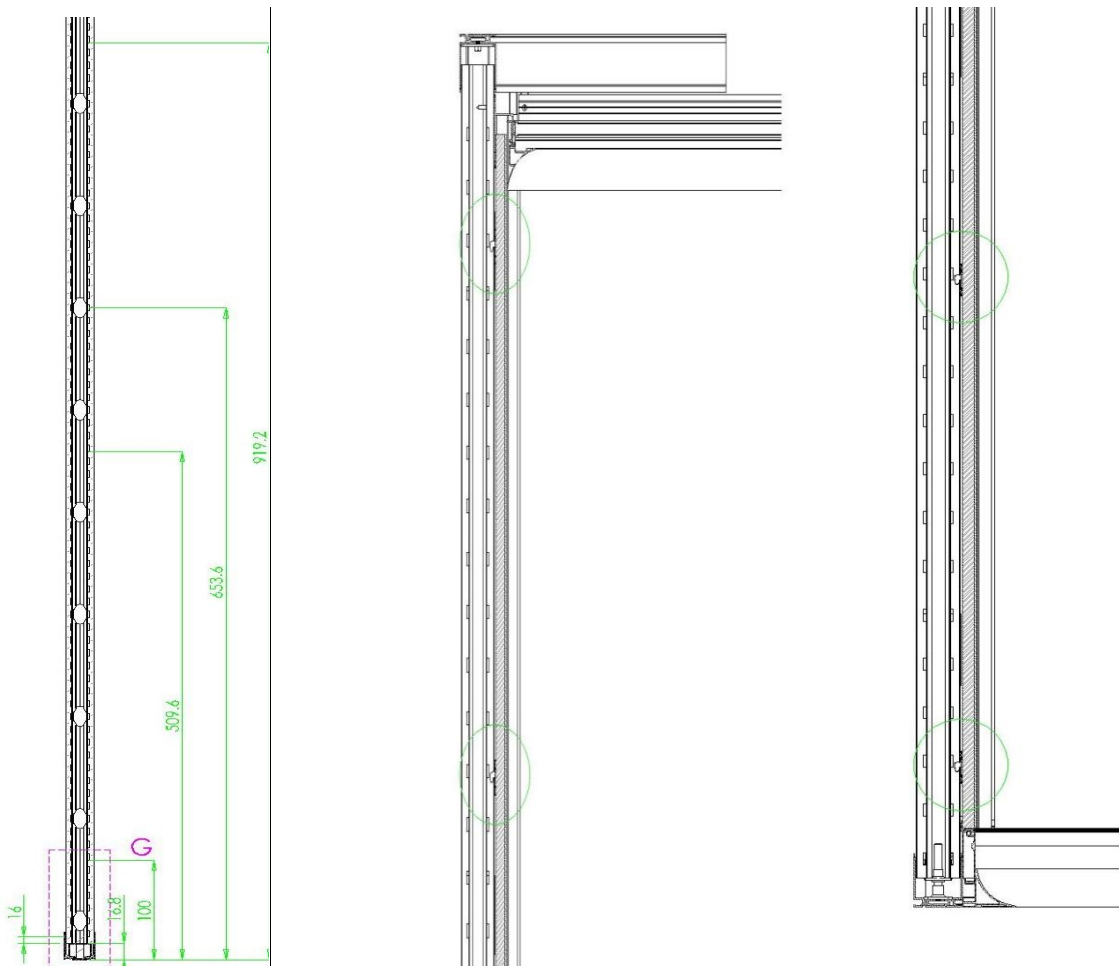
Details of structure and way to linked with wall panel, ceiling and floor
